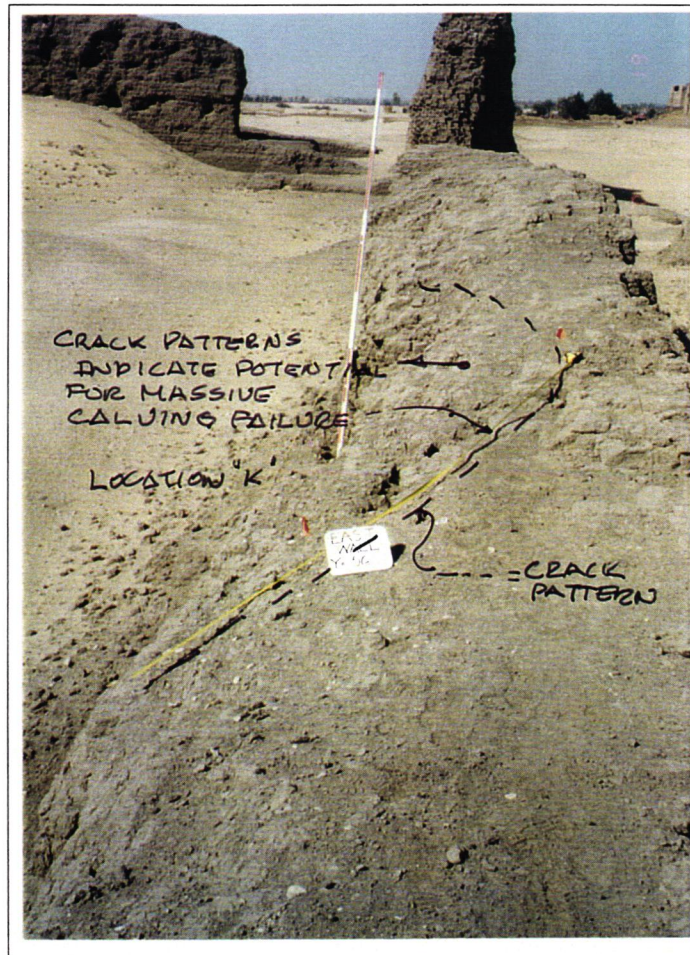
Massive Calving at "Section 3" East Main Enclosure Wall
